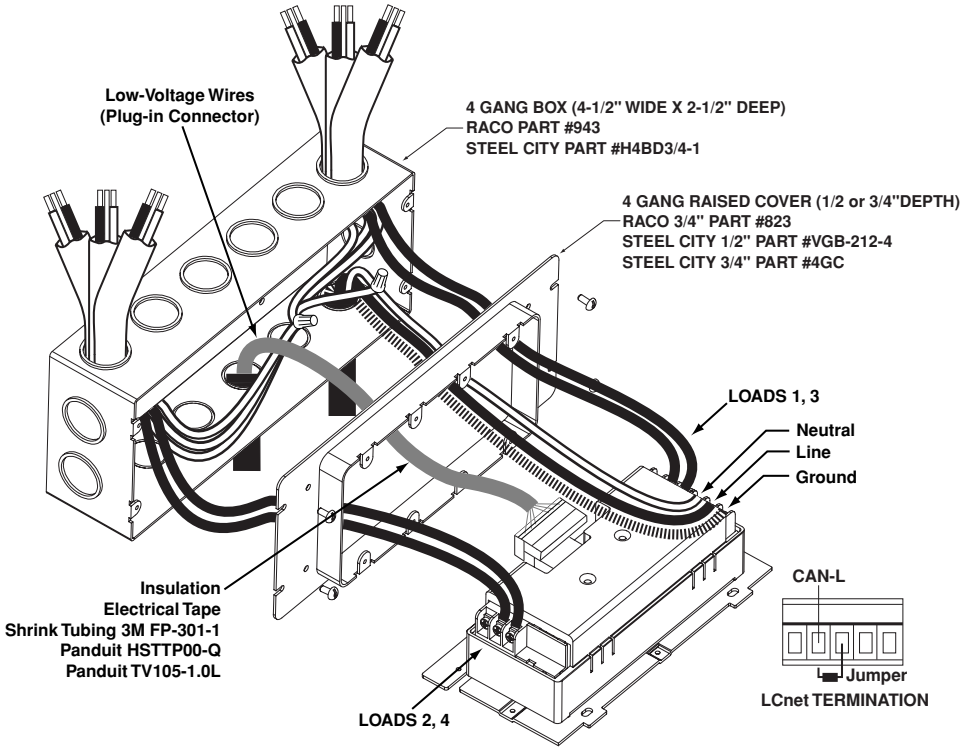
MULTIZONE CONTROLLER MOUNTING
